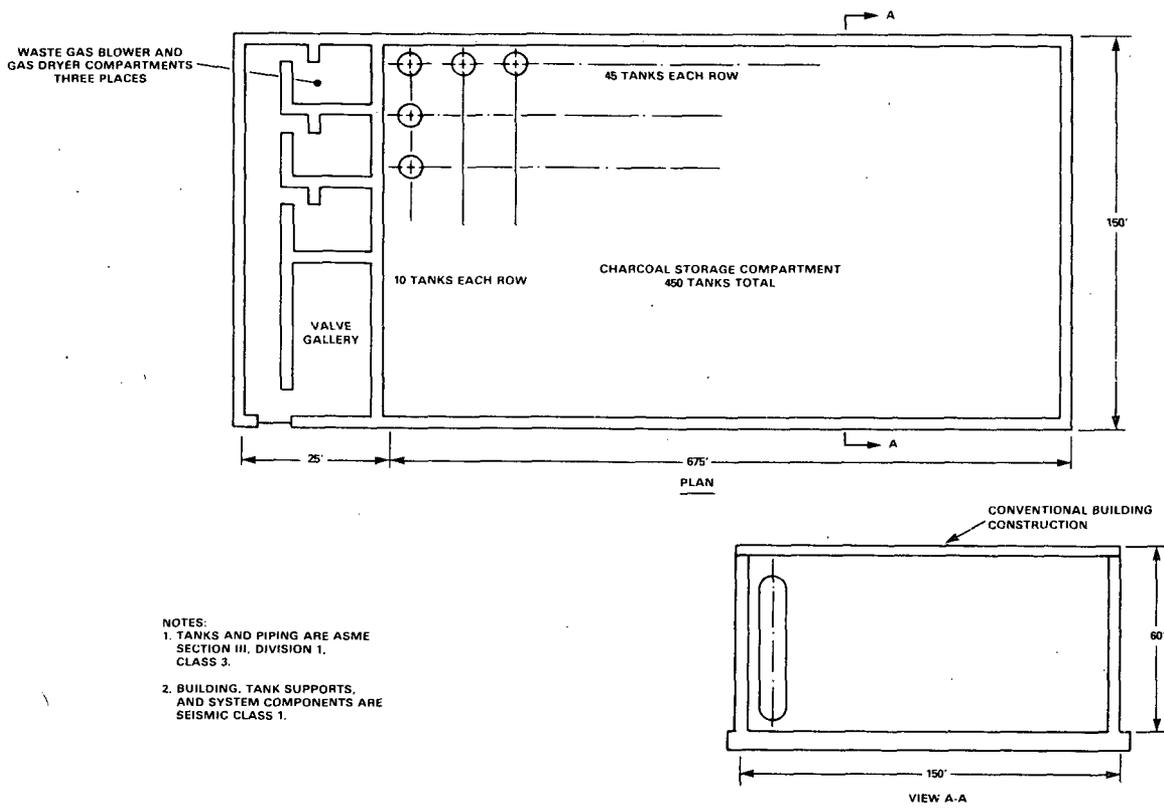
Conceptual Layout - Charcoal Storage Arrangement
